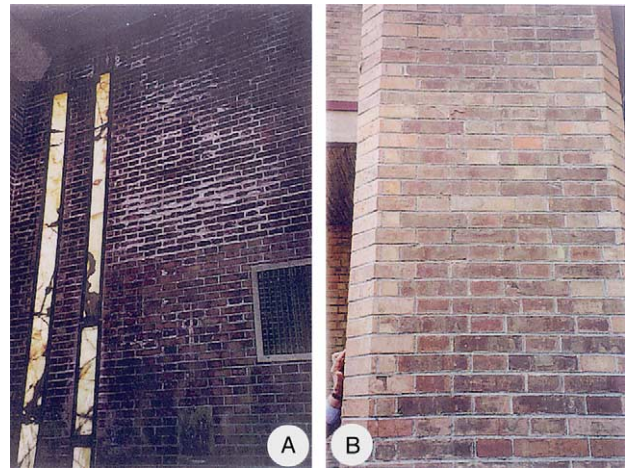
(A) Thaumasite efflorescences on the internal side of a brick-wall exposed to north. (B) External brickwall exposed to south without thaumasite efflorescences.
